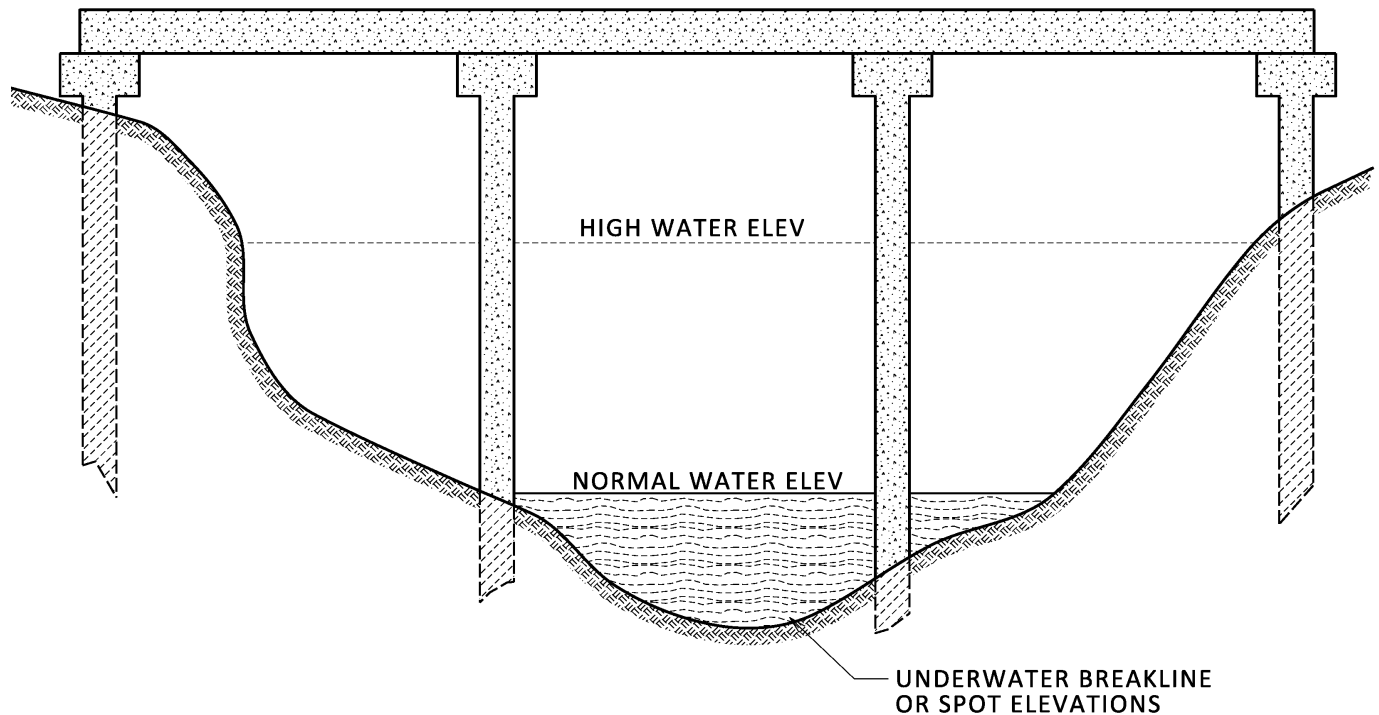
BRIDGE SURVEY DETAIL – WATER ELEVATIONS
